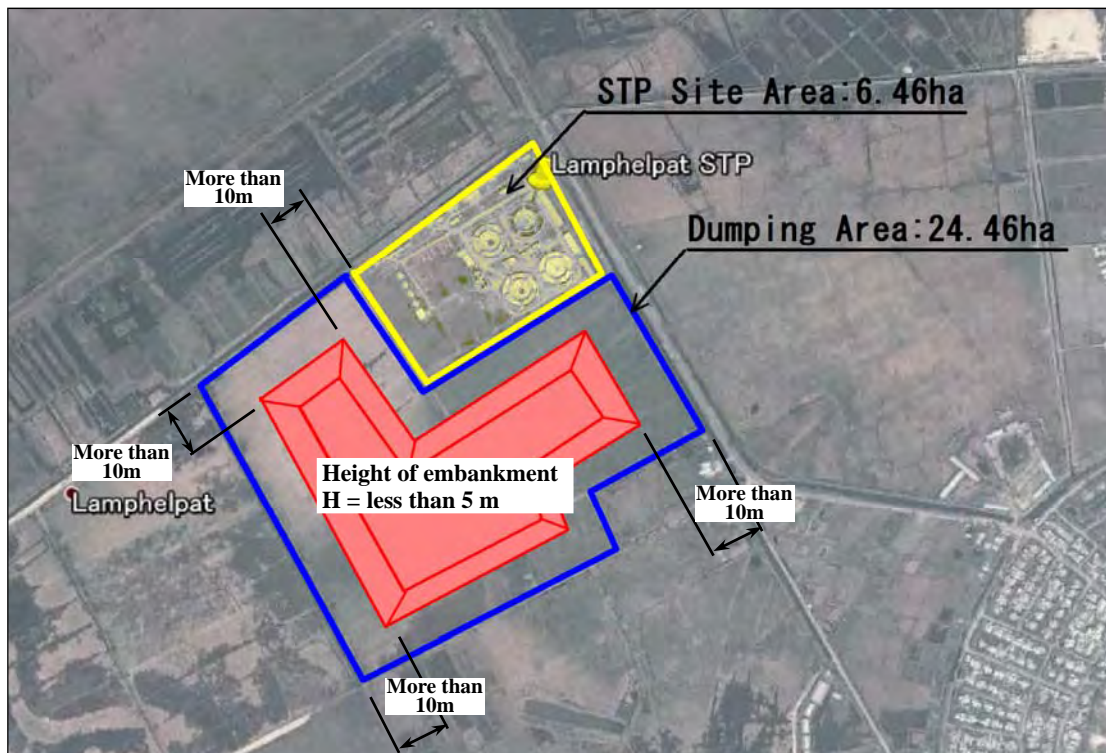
Site Plan of Lamphel Pat STP (Under construction)
